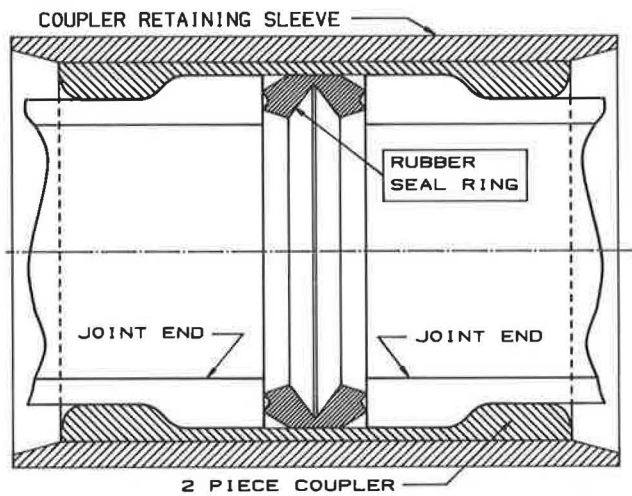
Section detail of a high-tensile-strength composite coupler and seal assembly.
